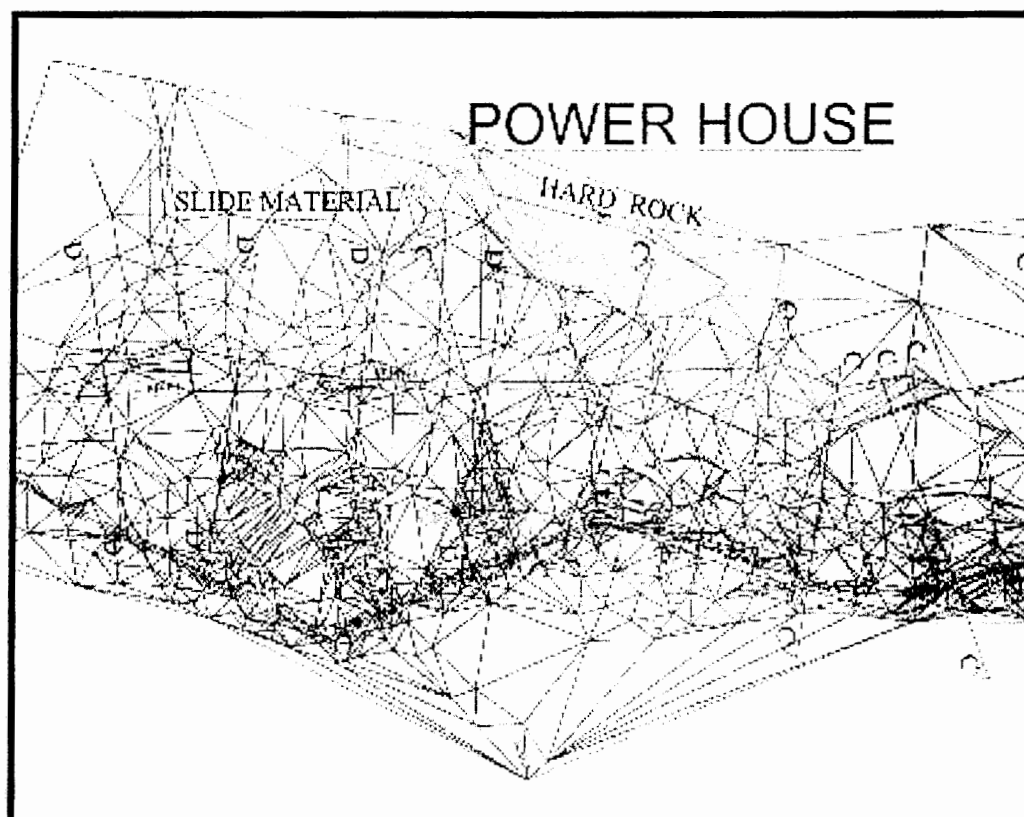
View of Trigonometric Network at Powerhouse Site
